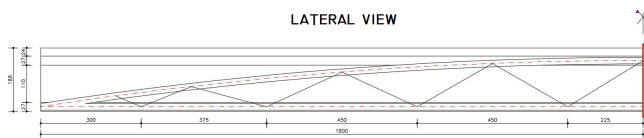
Longitudinal view of half strengthening system with the concrete beam in the background
